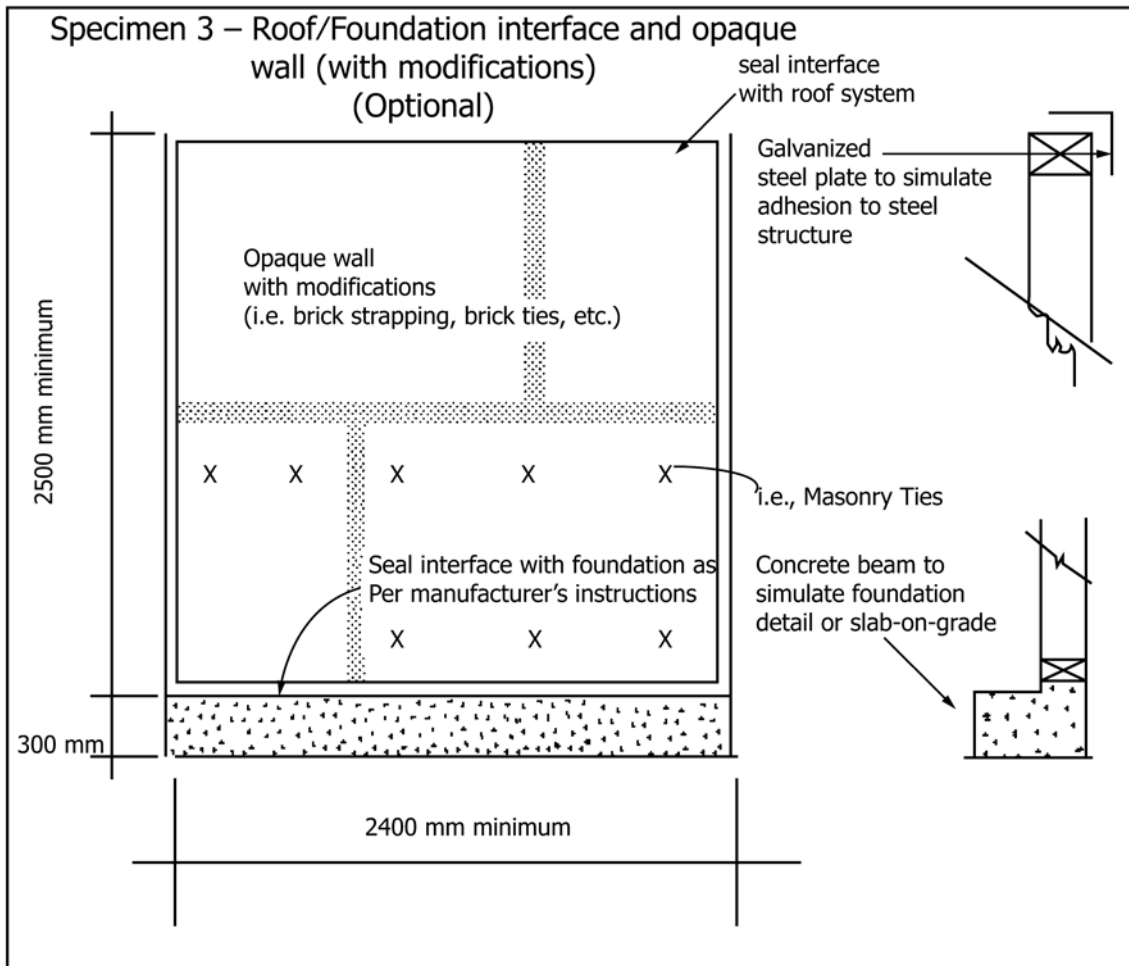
Specimen 3—Roof/Foundation Interface and Opaque Wall (with Modifications) (Optional)
